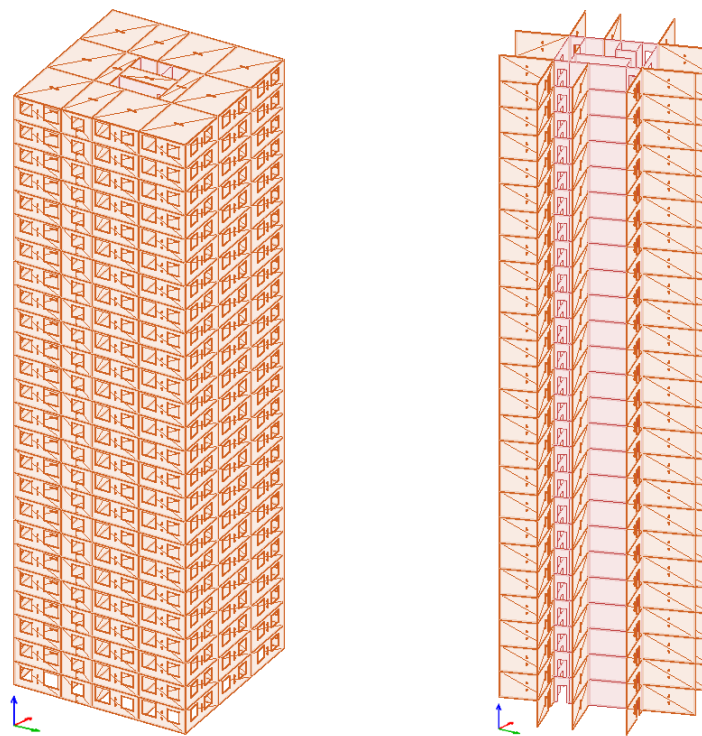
Hybrid timber building with concrete core extending along the buildings height.
